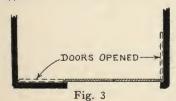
has an opening at one side with a right angle door and one sliding door. This arrangement of the tracks and hangers is the same as described in Fig. 1, with the exception that one door runs parallel with the front wall.
